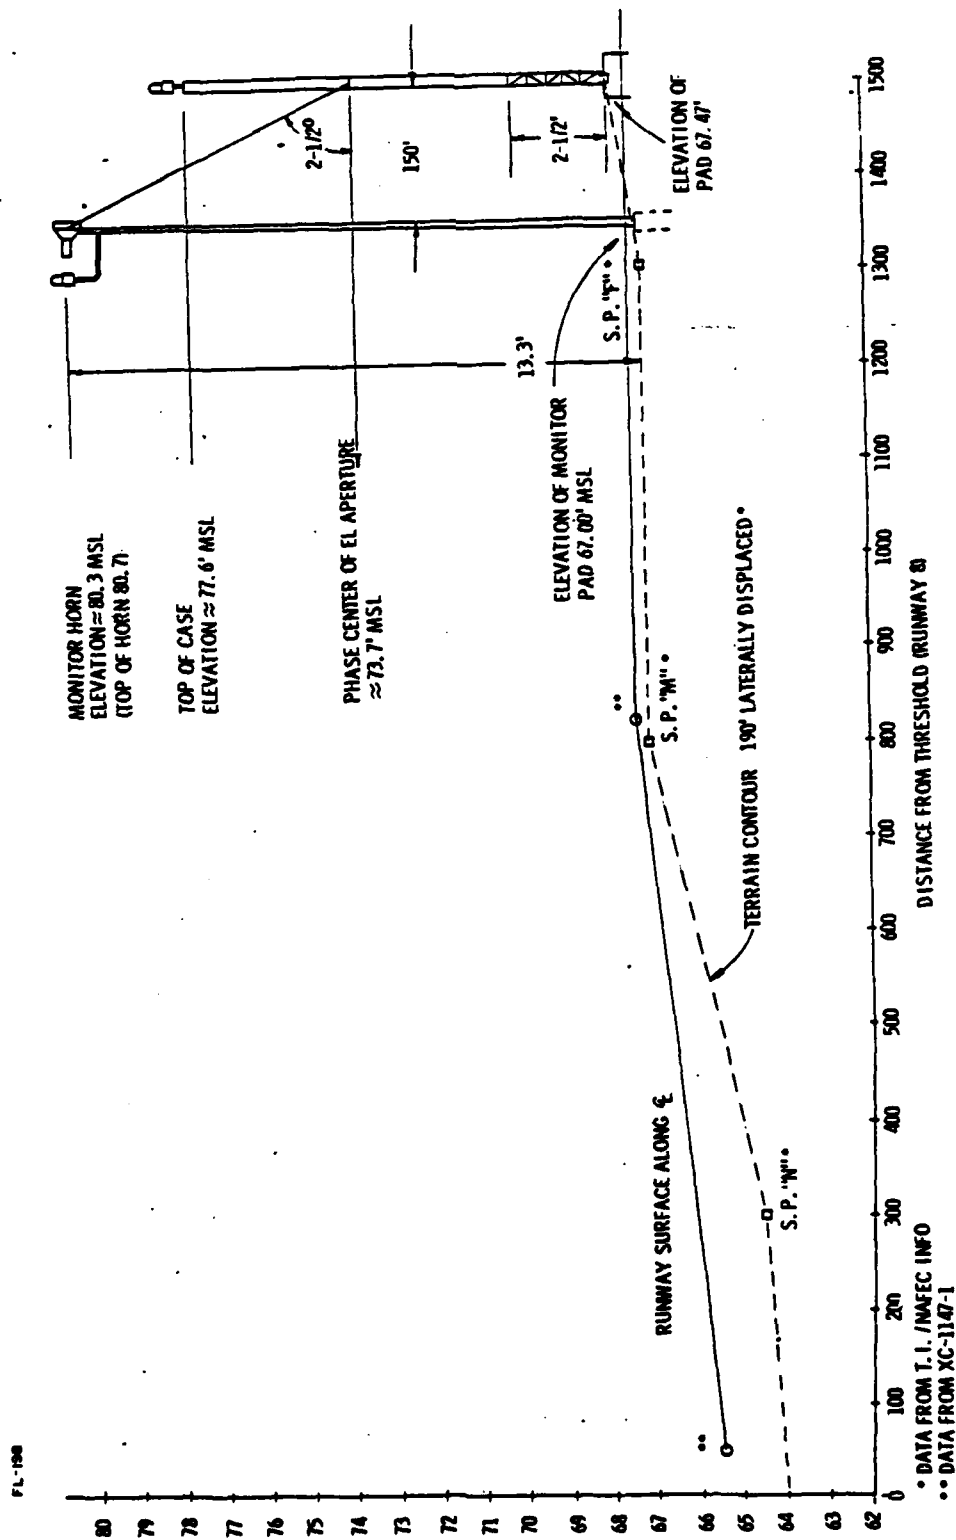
SC EL SITING (ELEVATION VIEW), RUNWAY 8
